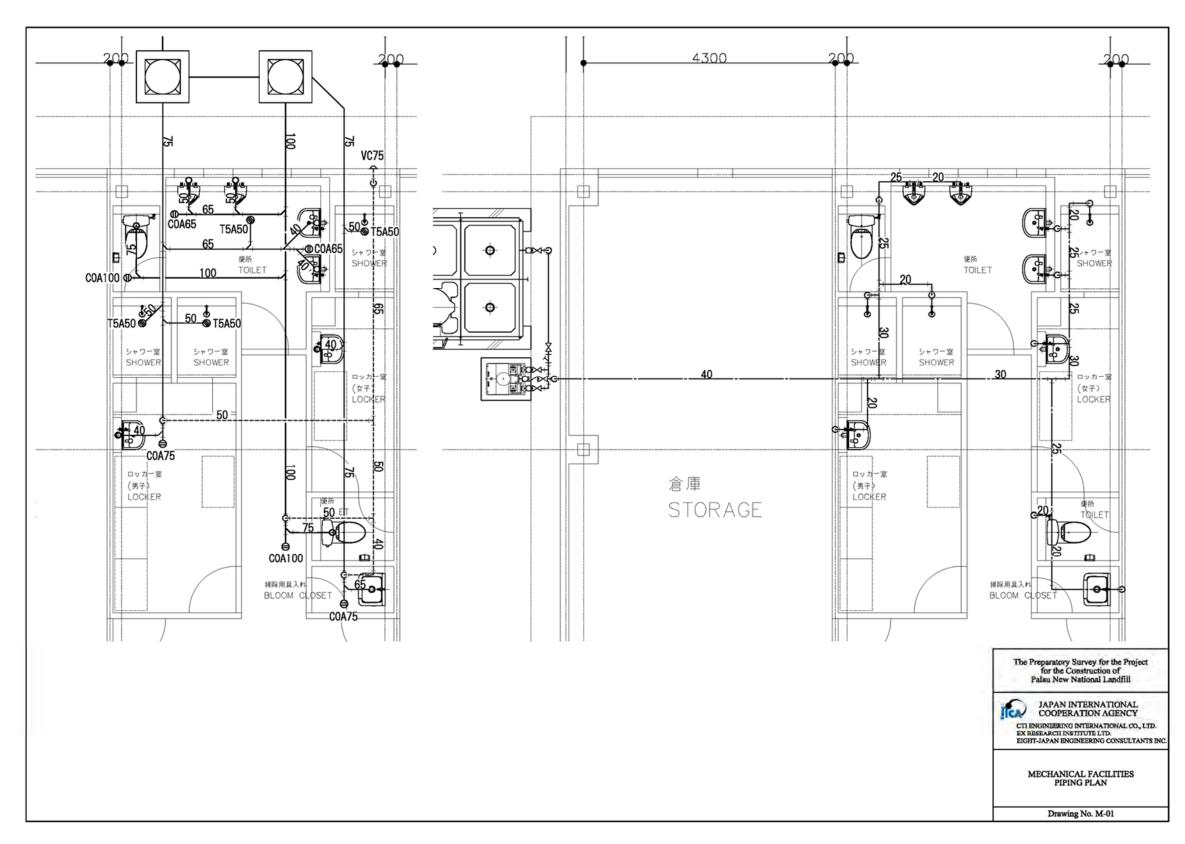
Mechanical Facilities in Administration Building Piping Plan
